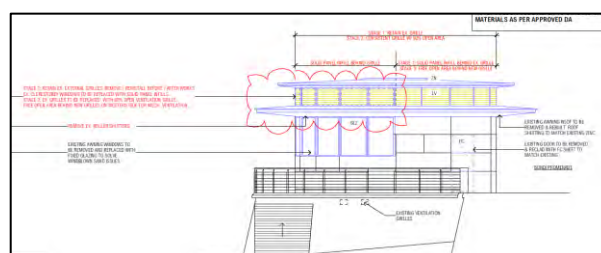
Approved north (promenade) elevation of Lifeguard Tower, Tunnel 2 and Amenities block.
